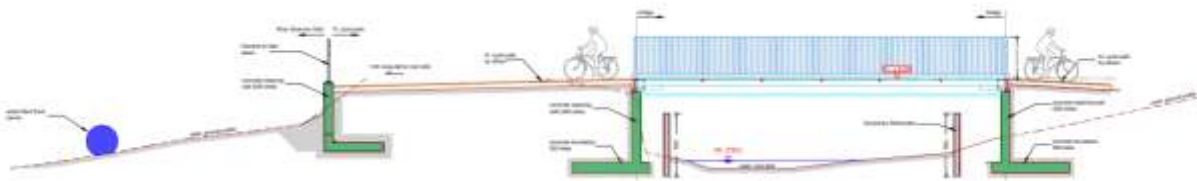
Section of retaining wall for proposed Ramp and Abutment walls for proposed Bridge 5 (refer to drawing RHA-XX-DR-S-SP0052)
